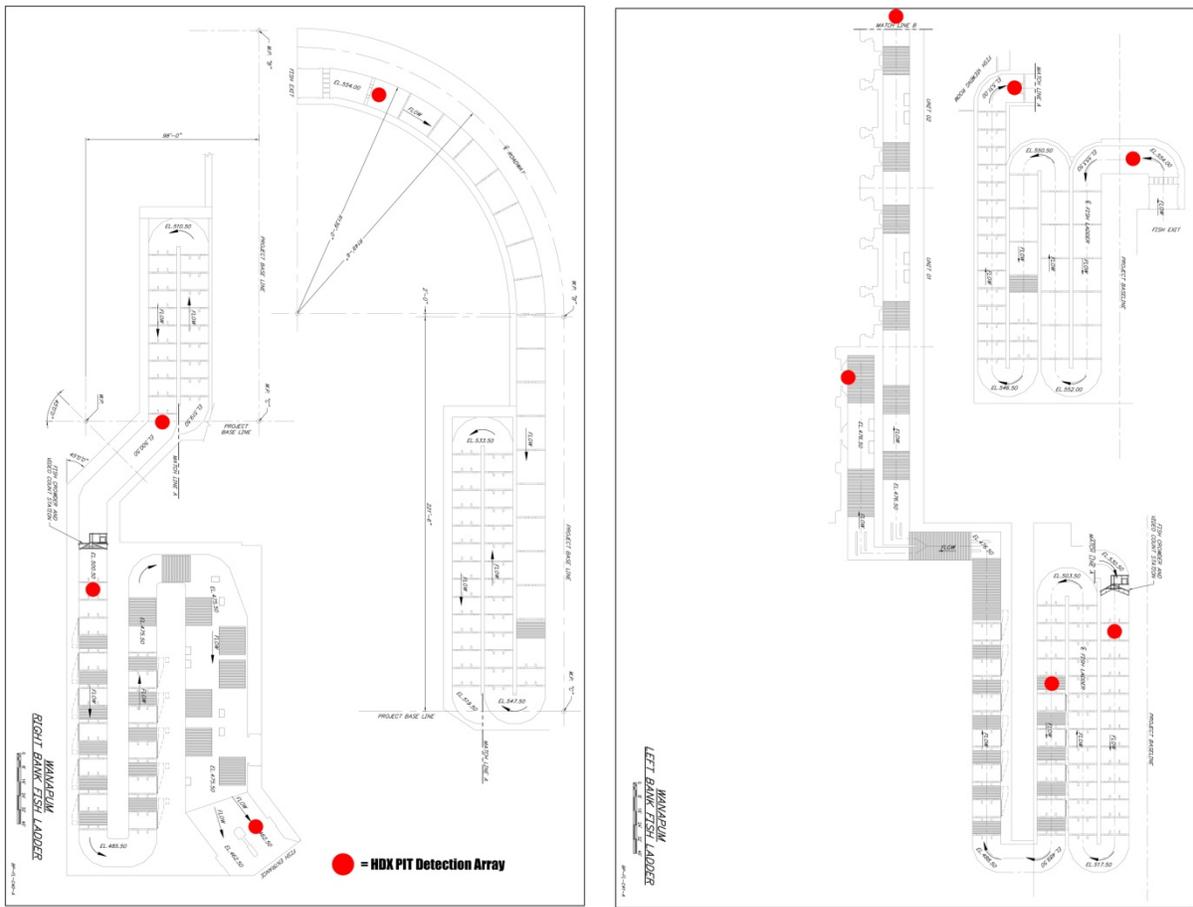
Location of HDX PIT detection arrays at Wanapum Dam.
